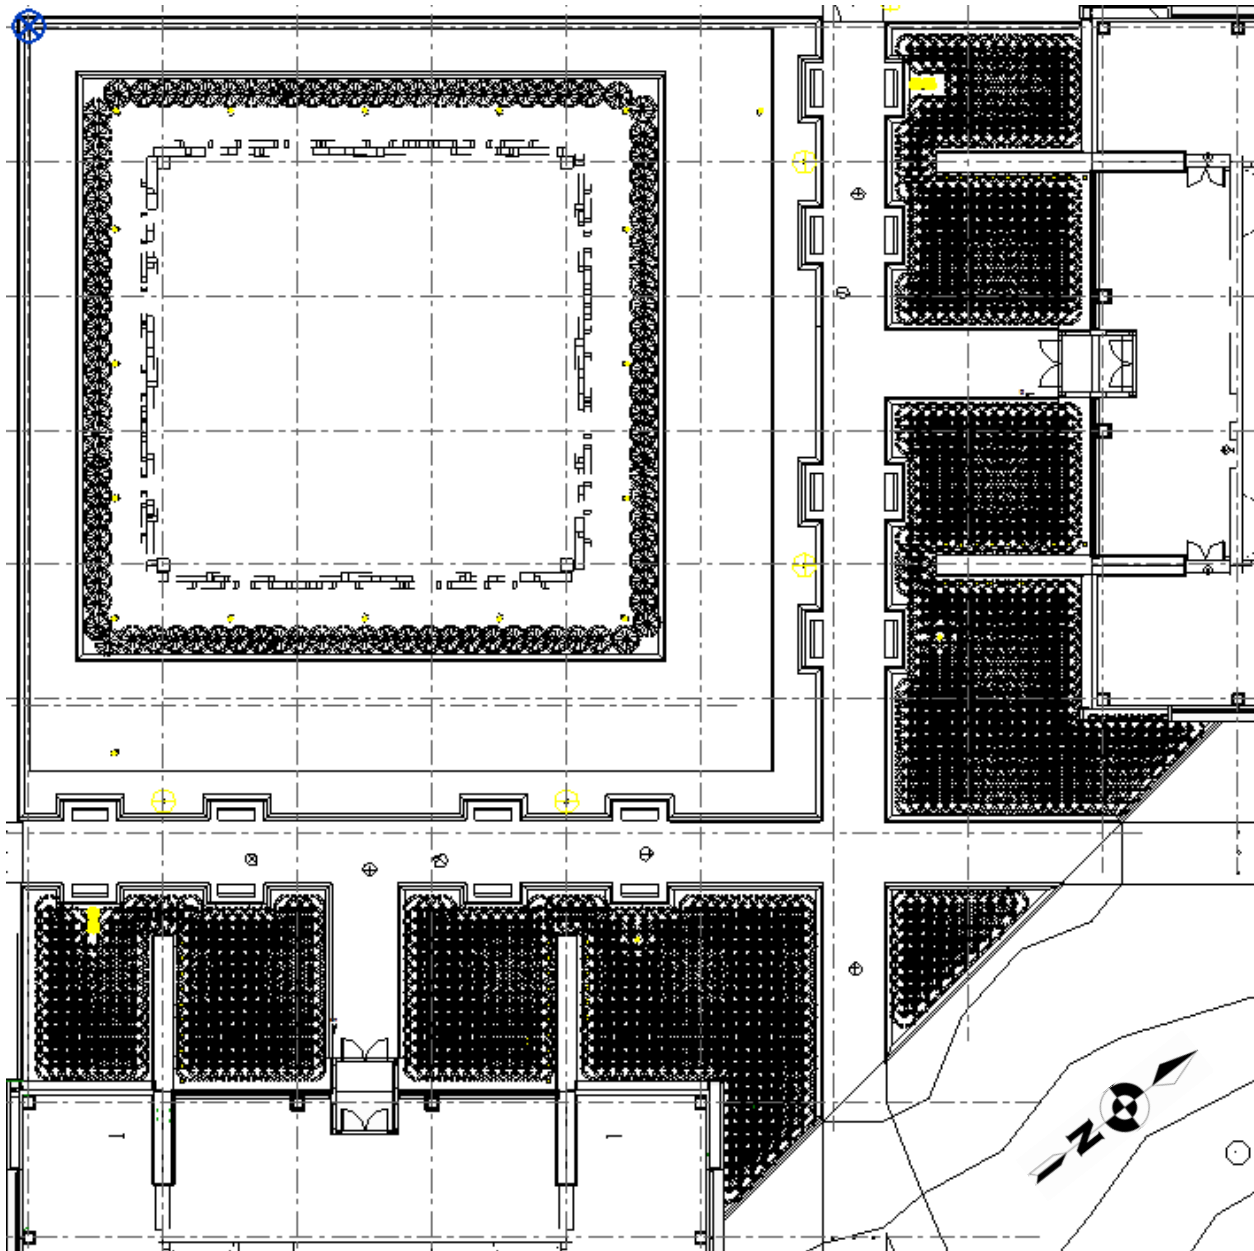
Cantilever Courtyard Plan from KGB Maser Central Revit Model
